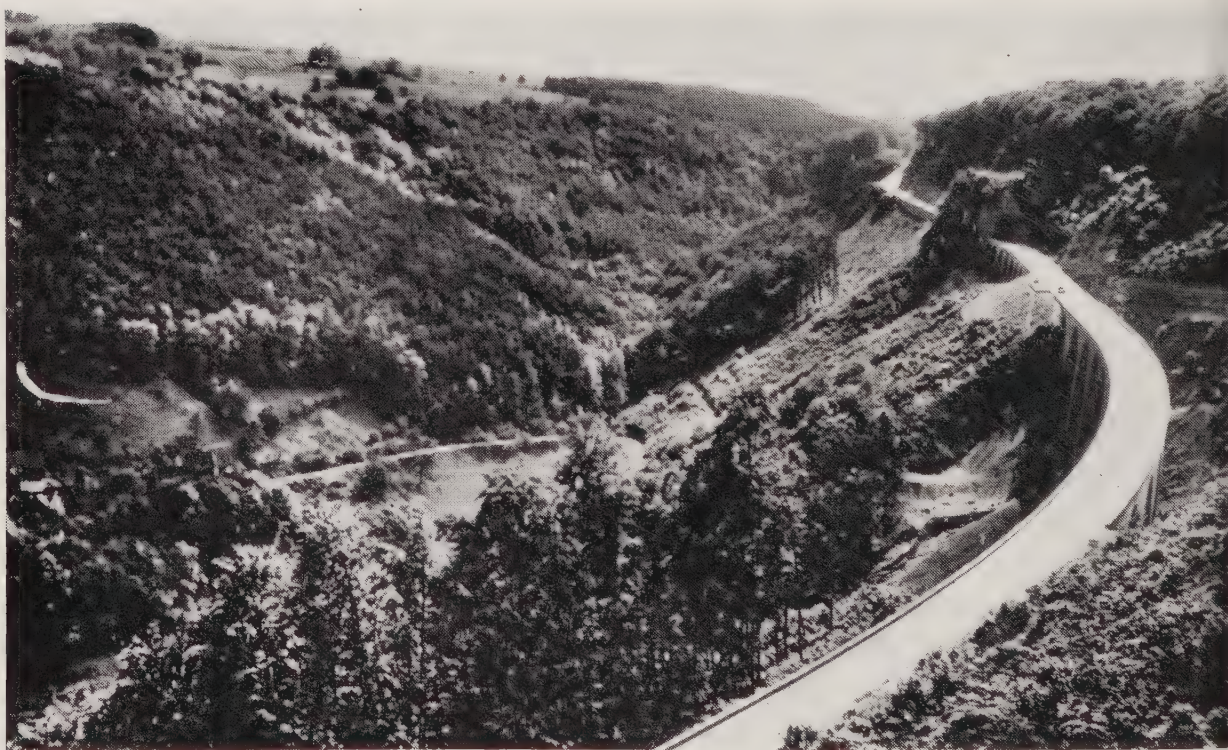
The Stuttgart—Ulm autobahn : Drachensteiner Hang
